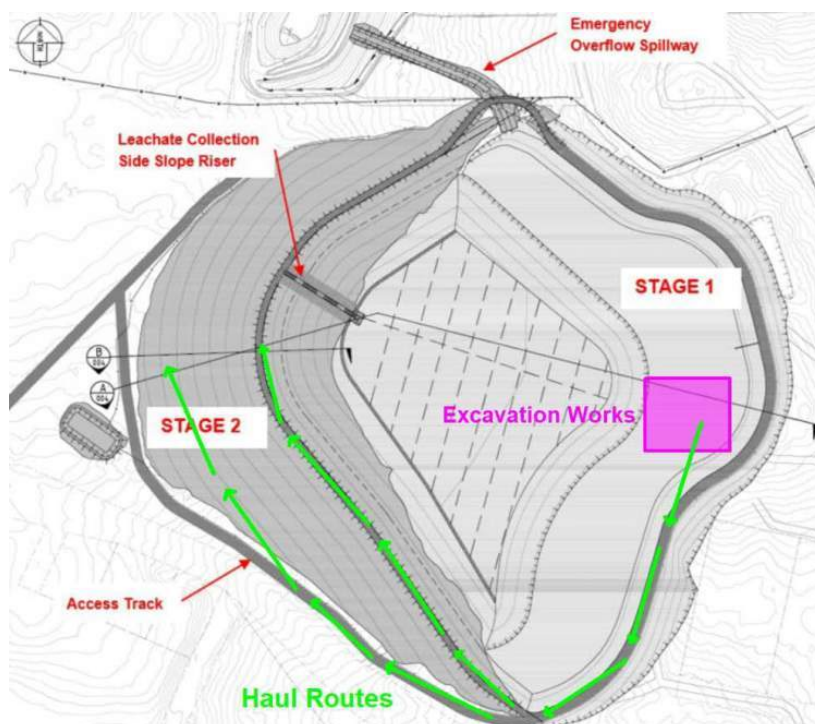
Scenario 3 – TSF4 construction - location of modelled construction excavation works and haul routes
